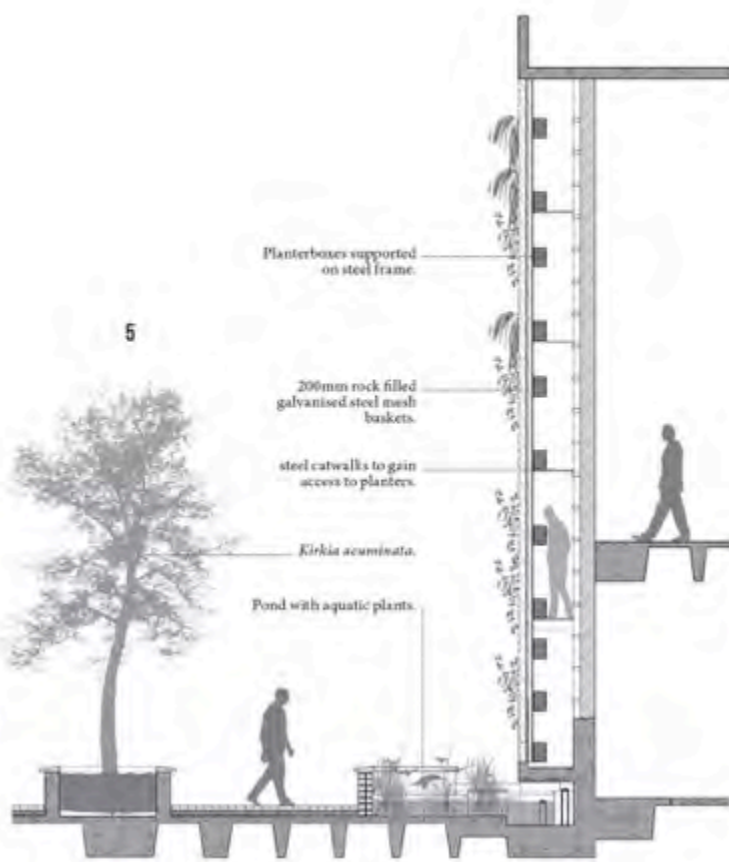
Top Left: Section through the rock-filled living wall at the UP Plant Sciences building at the University of Pretoria
